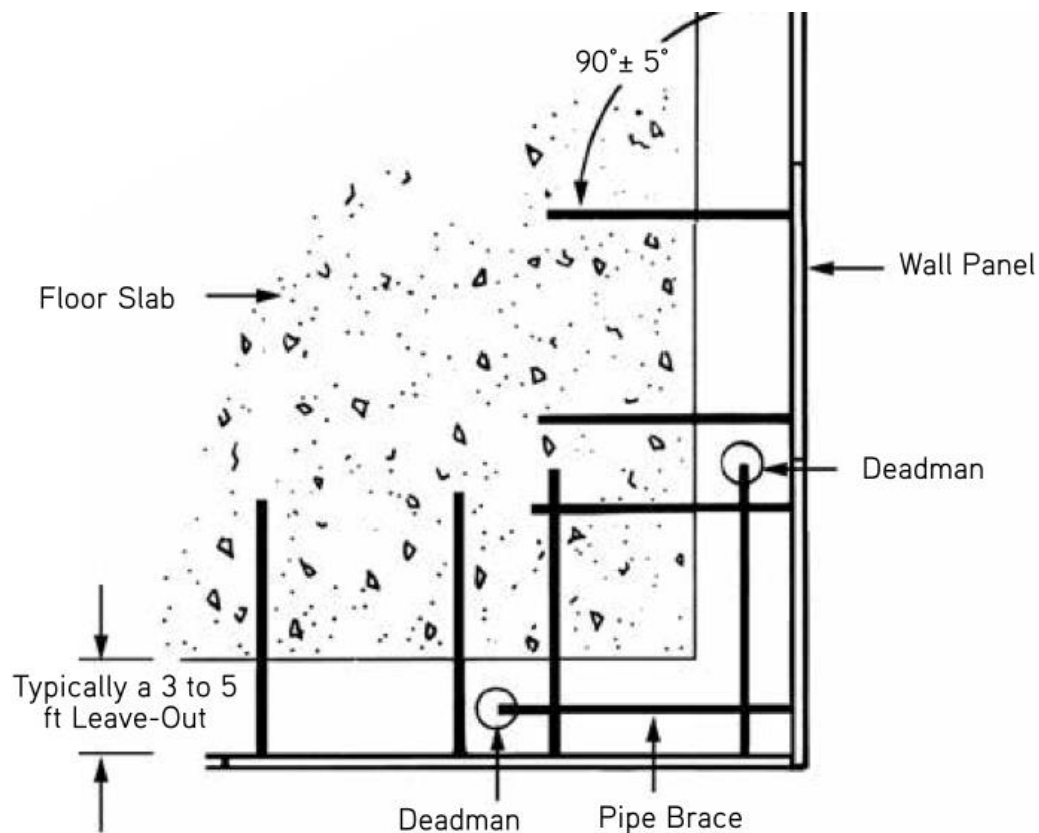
Plan View of Concrete Deadmen Anchoring Corner Panel Braces (Reproduced from Dayton Superior, 2017)
